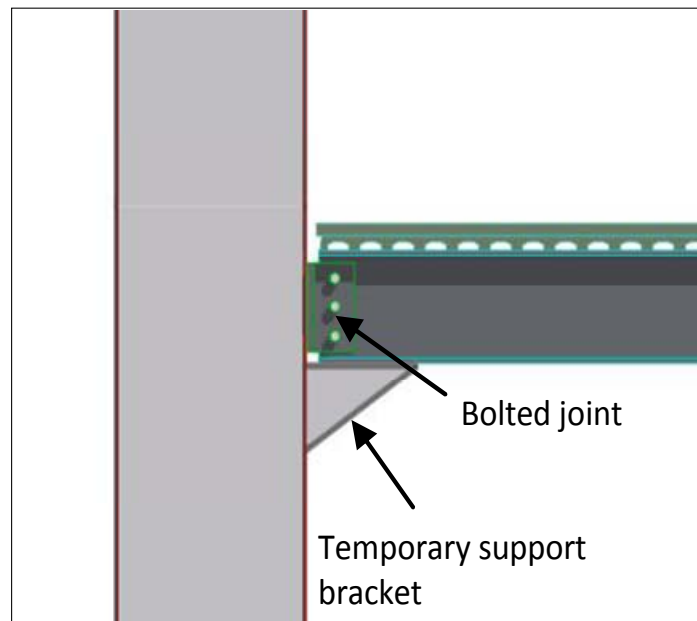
Temporary support brackets to ease placing gravity beams at the vertical members
